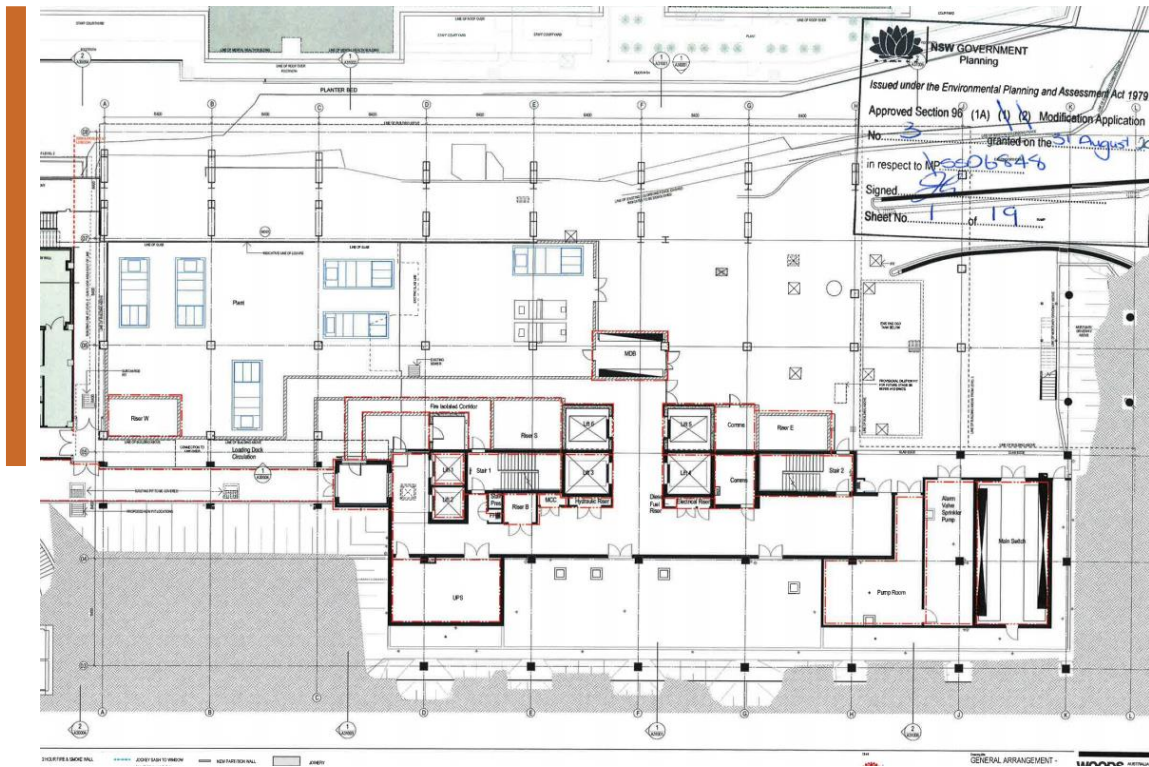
Approved L03 Floor Plan (Source: Woods Bagot)
